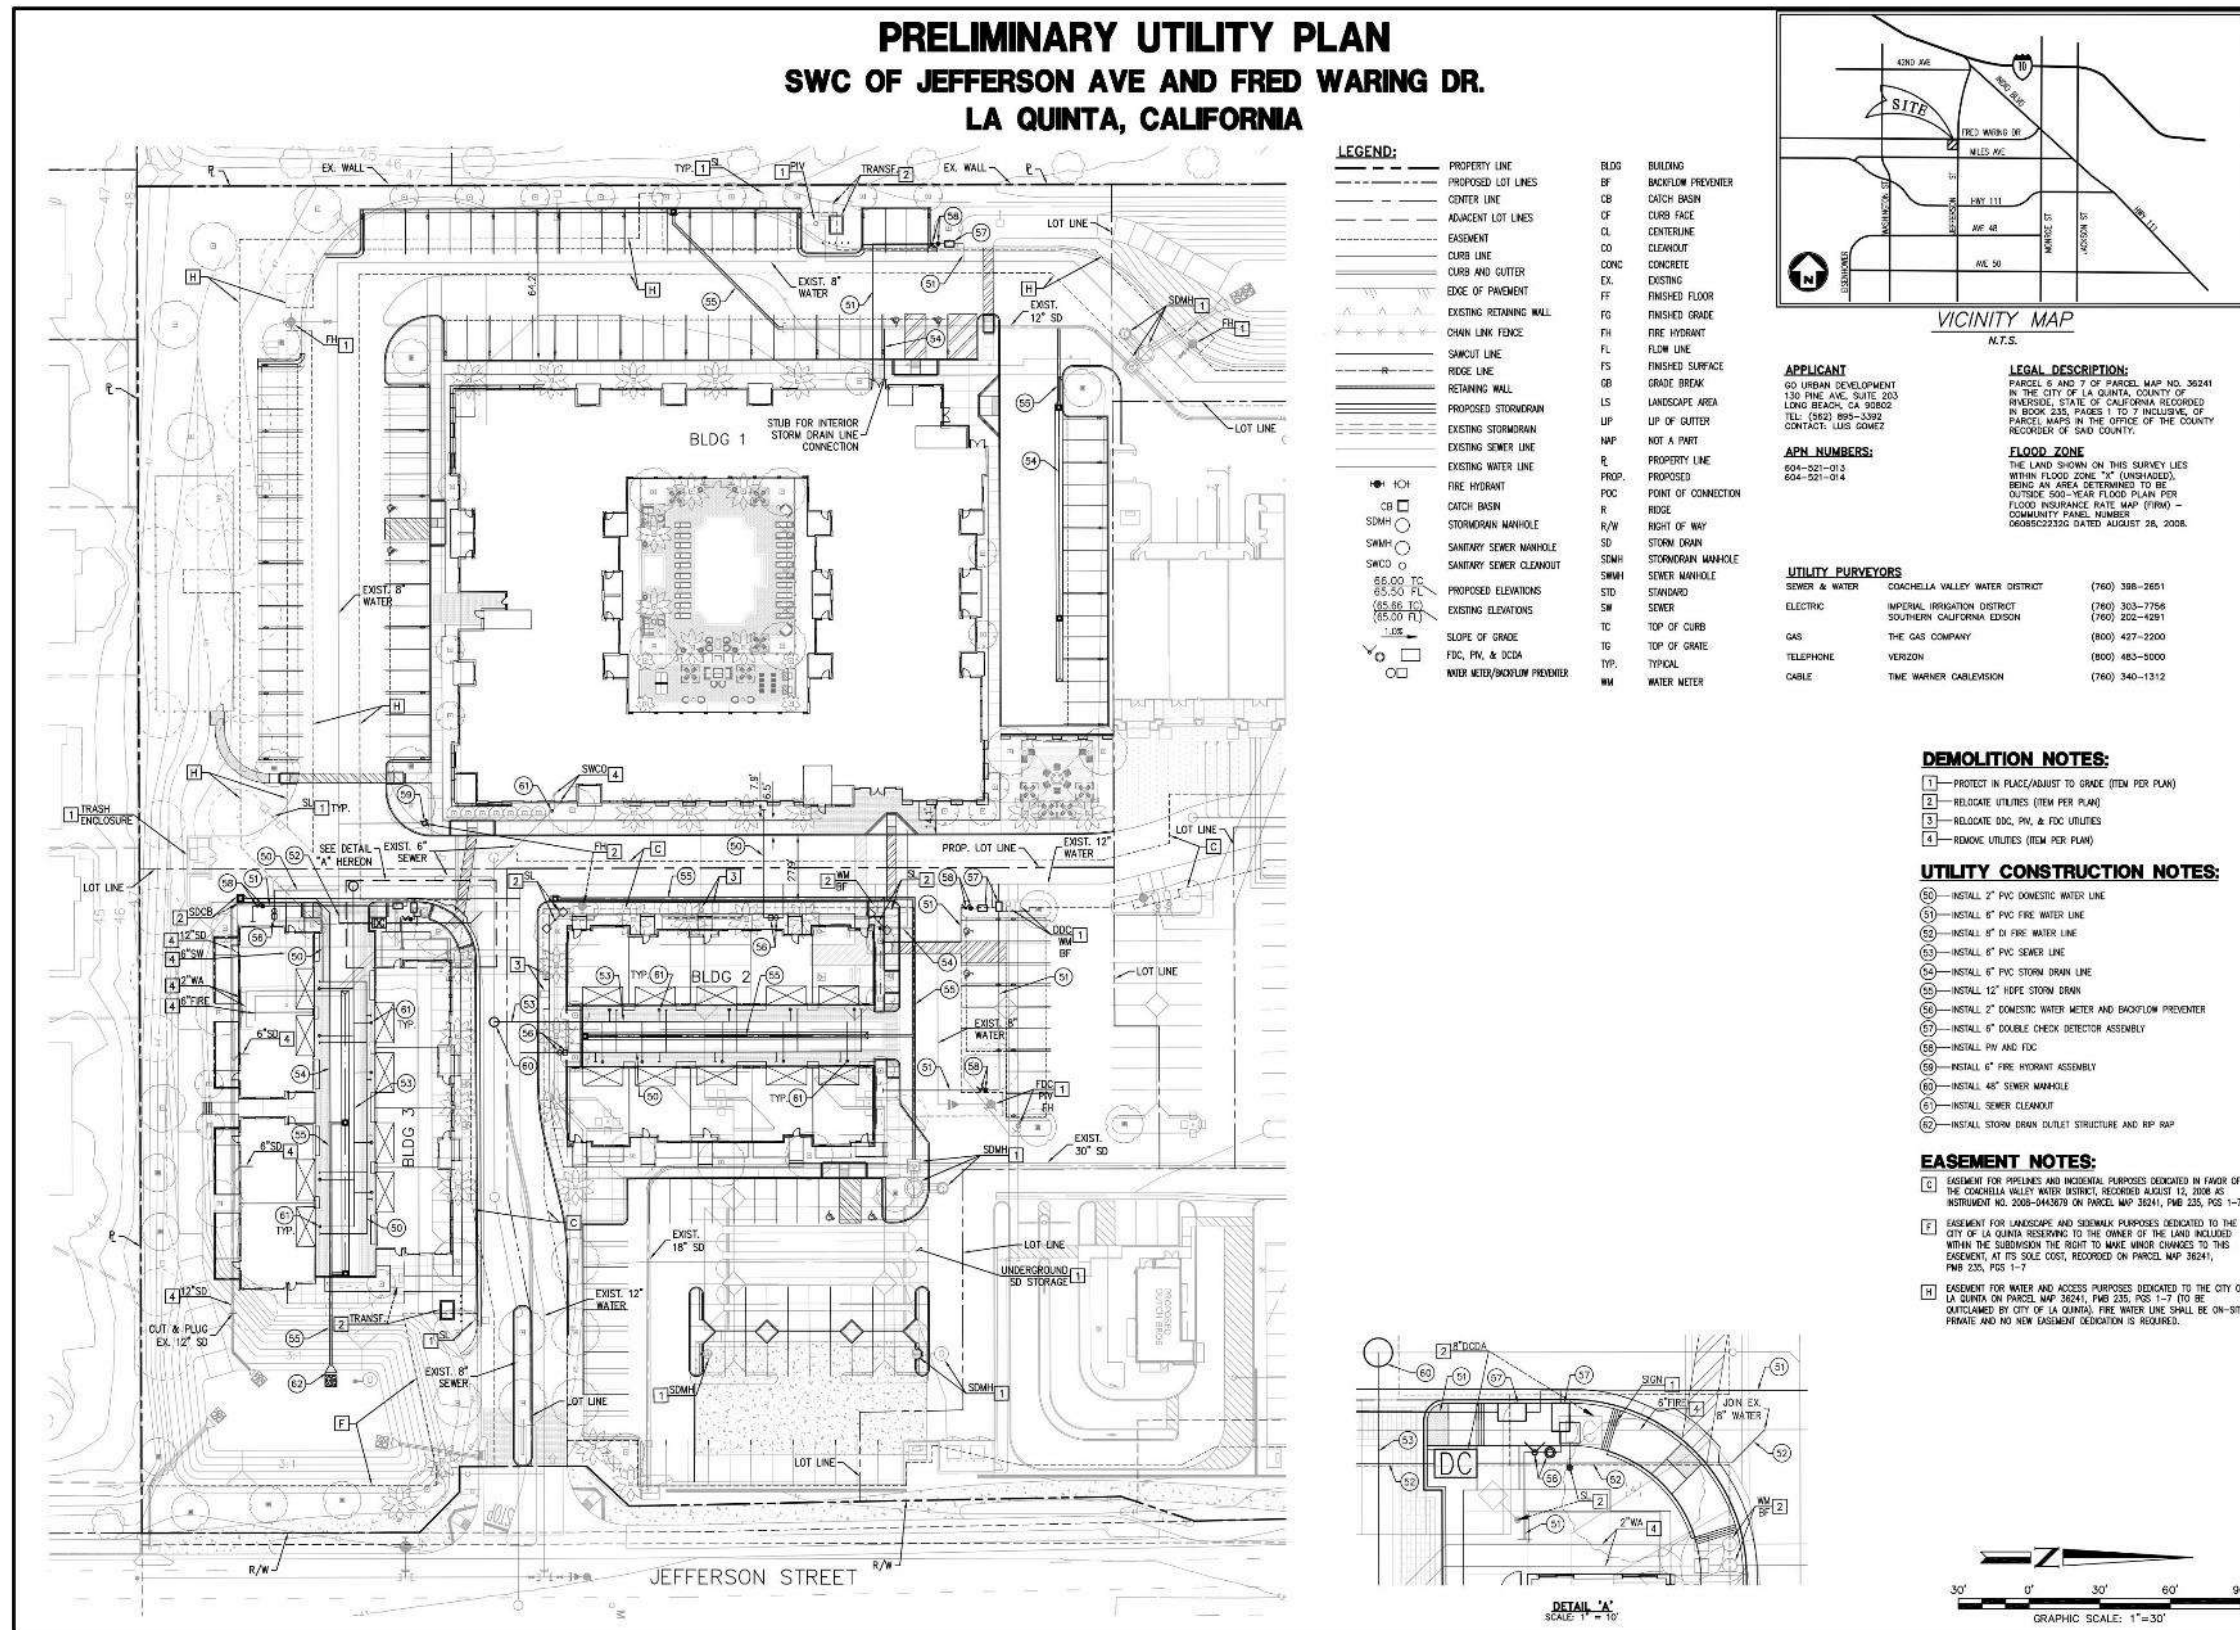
PA2 Conceptual Multifamily Sewer and Water Plan
